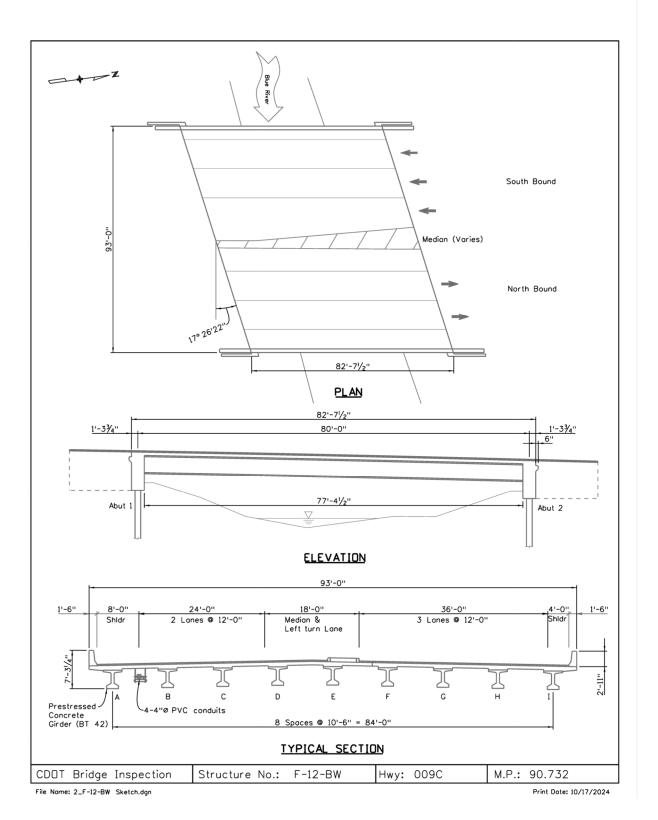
Bridge Inspection Sketch – Example 2
